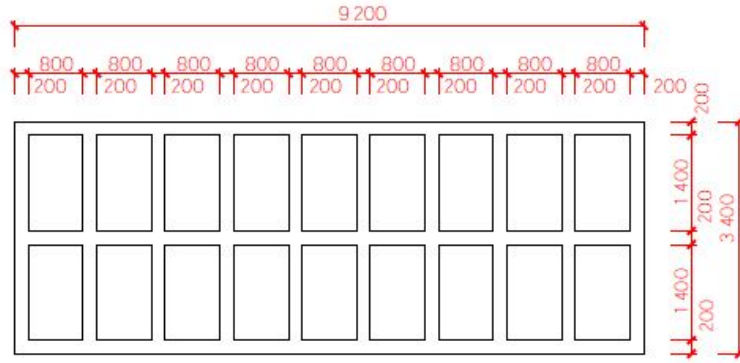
Initial Foundation Beam and Tank Plan
